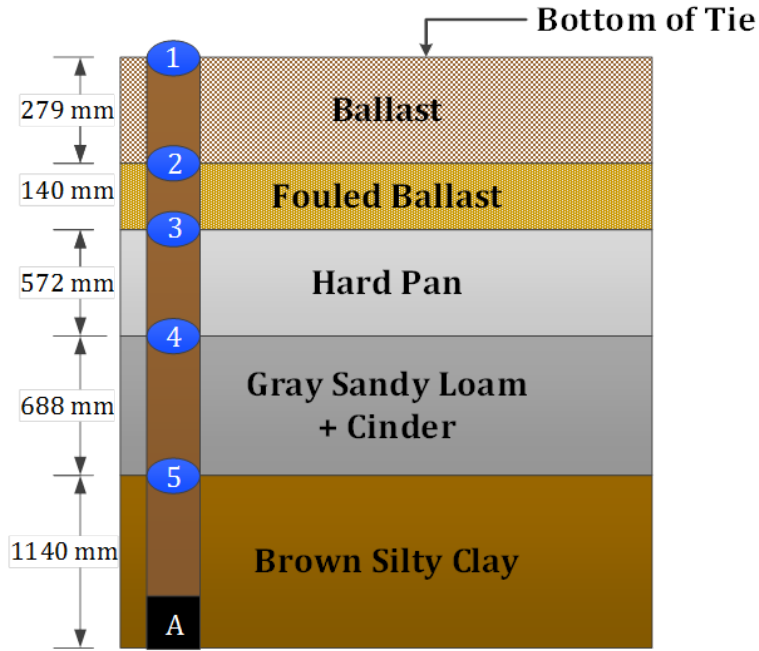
Substructure Layer Profile for Madison Street 12 ft From the South Abutment (Track 2)
